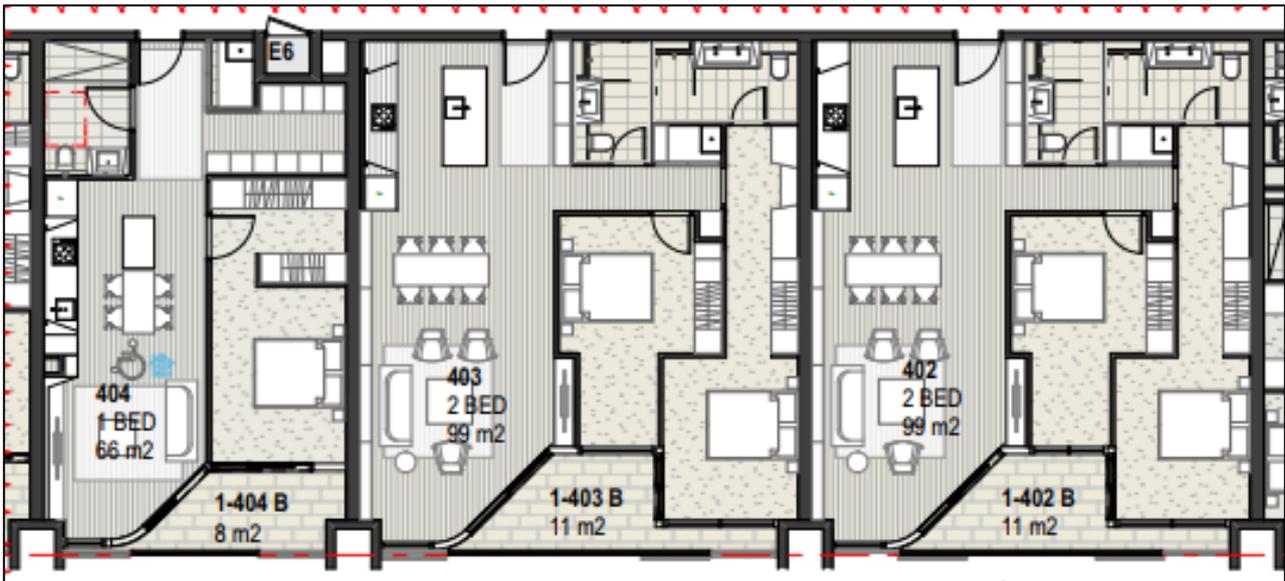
Layout of three units (levels two to five) on eastern side of Building 1 (Source: Architectural plans)
